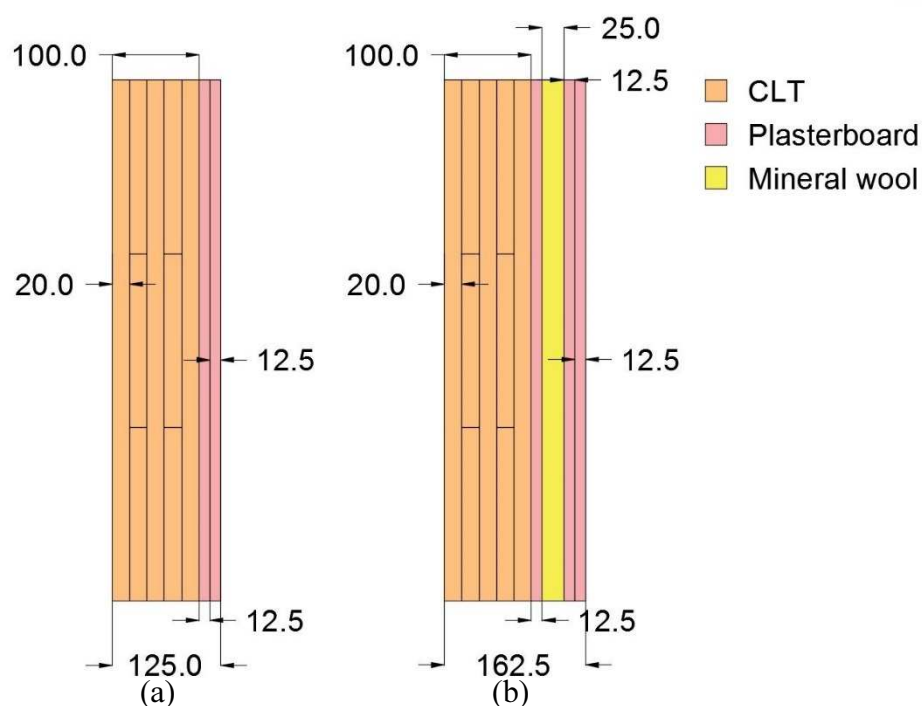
Encapsulation cross-section for (a) experiment α -1; (b) all other experiments. All dimensions in mm.
